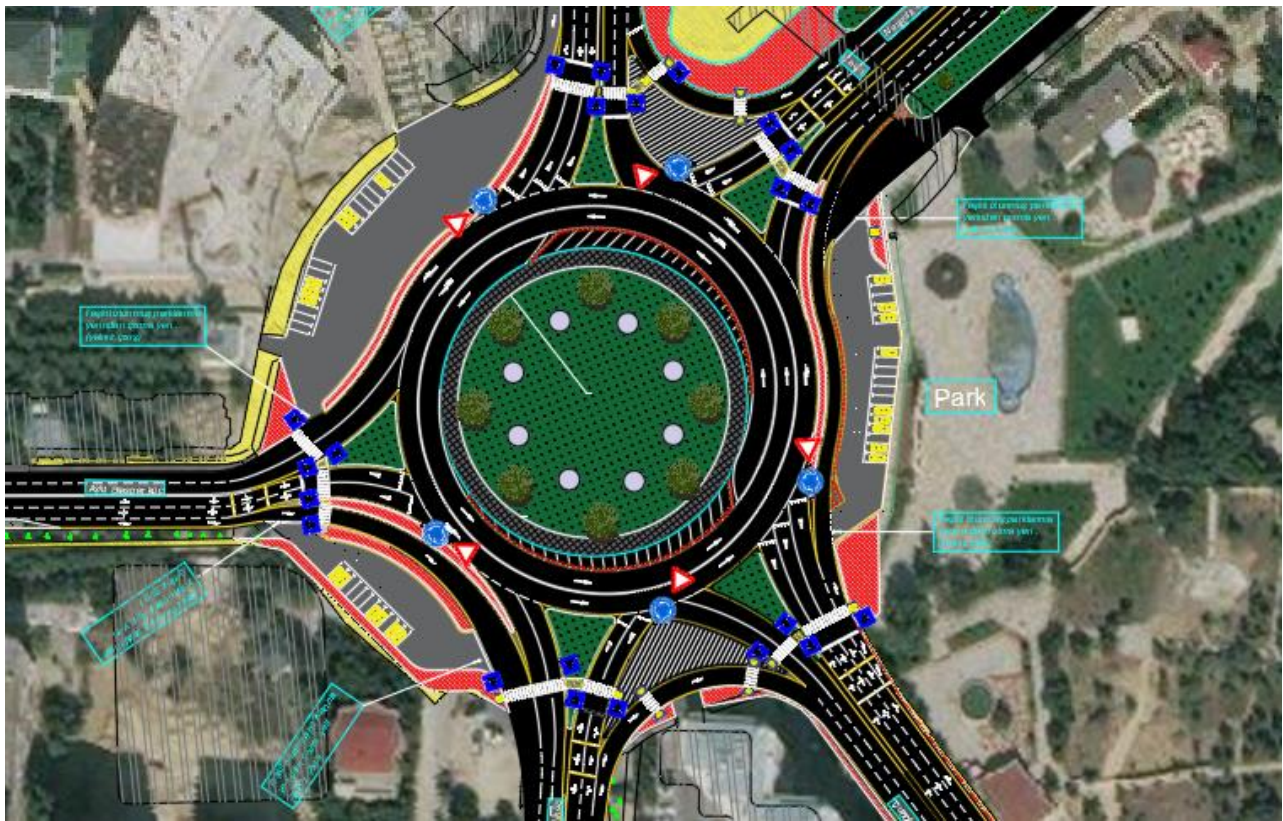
Geometrical plan view of the turbo roundabout.
